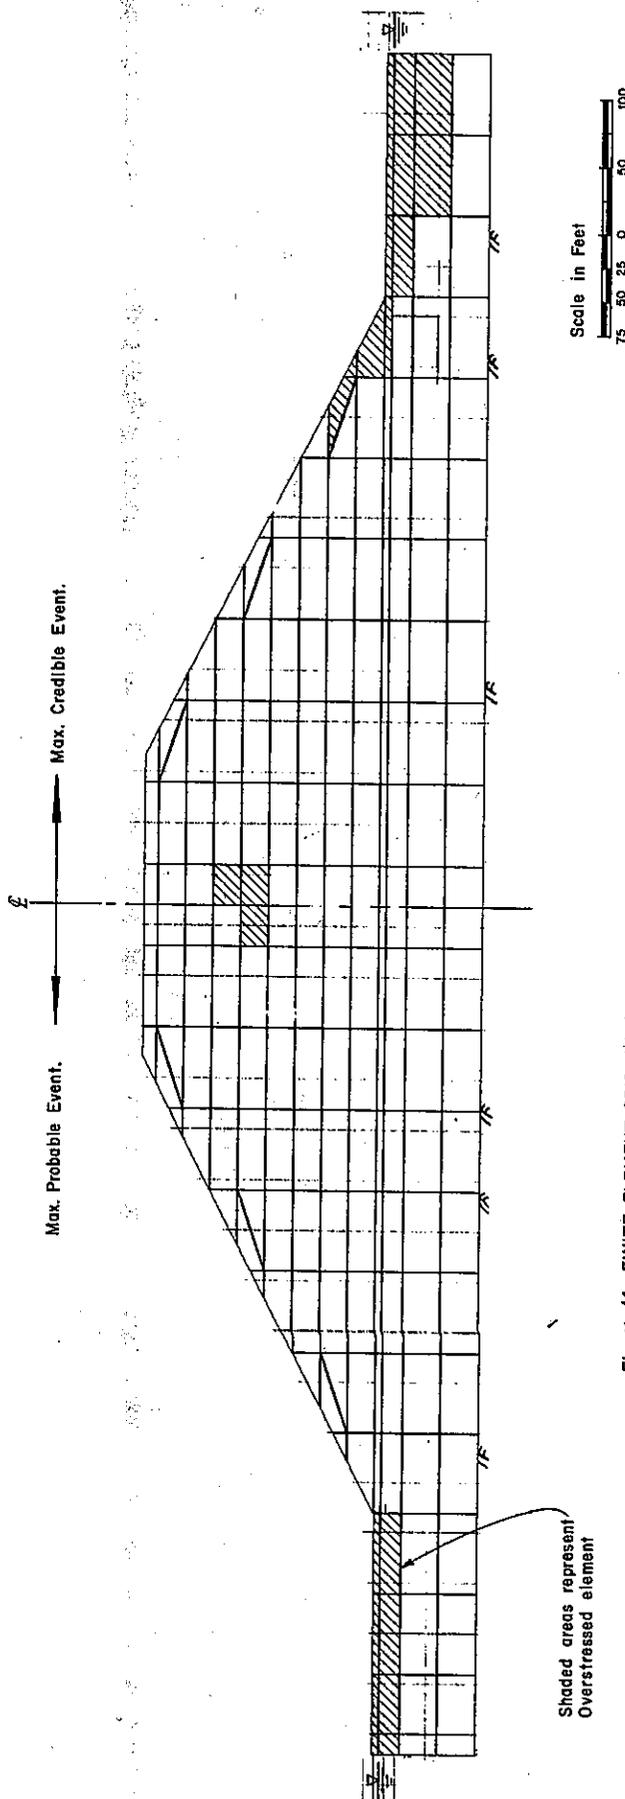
, FINITE ELEMENT GRID OF EMBANKMENT AND FOUNDATION ILLUSTRATING ELEMENTS OVERSTRESSED UNDER MAXIMUM PROBABLE EVENT (LEFT HALF) AND MAXIMUM CREDIBLE EVENT (RIGHT HALF)
